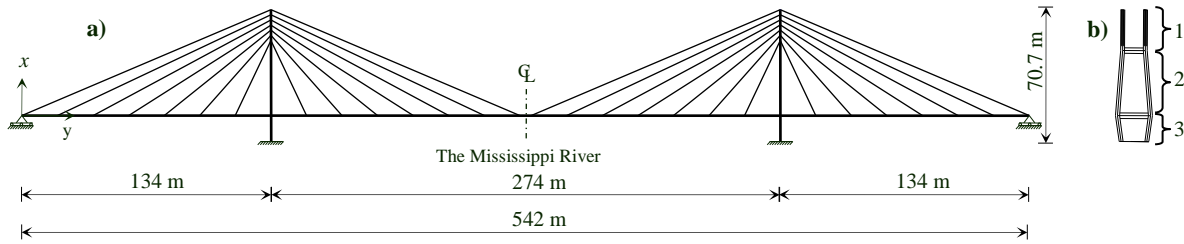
(a) Two dimensional Quincy Bay-view Bridge model, (b) cross-section of the tower
